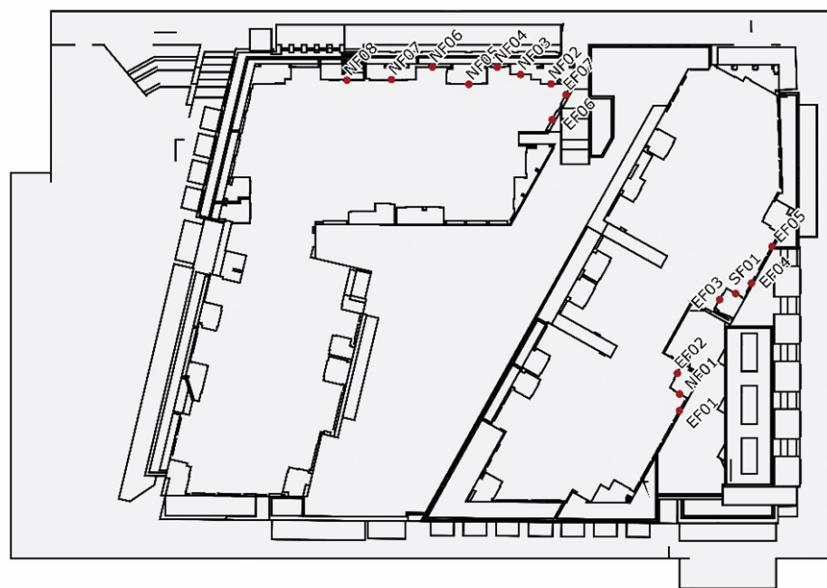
Layout of Pressure Sensors – Level 5 Plan
